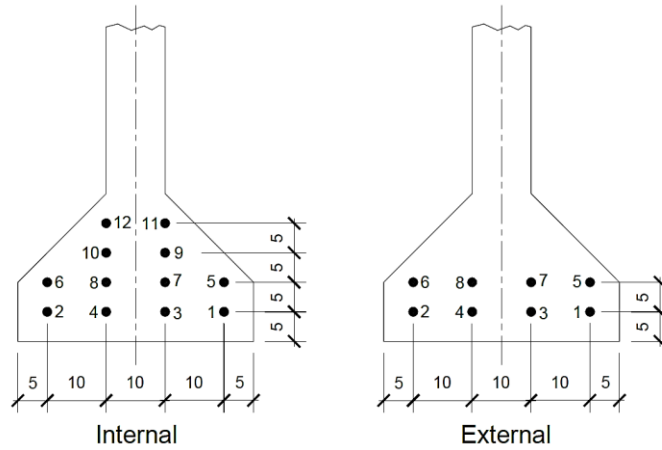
Prestressing cables distribution for internal and external beams (units in cm).
